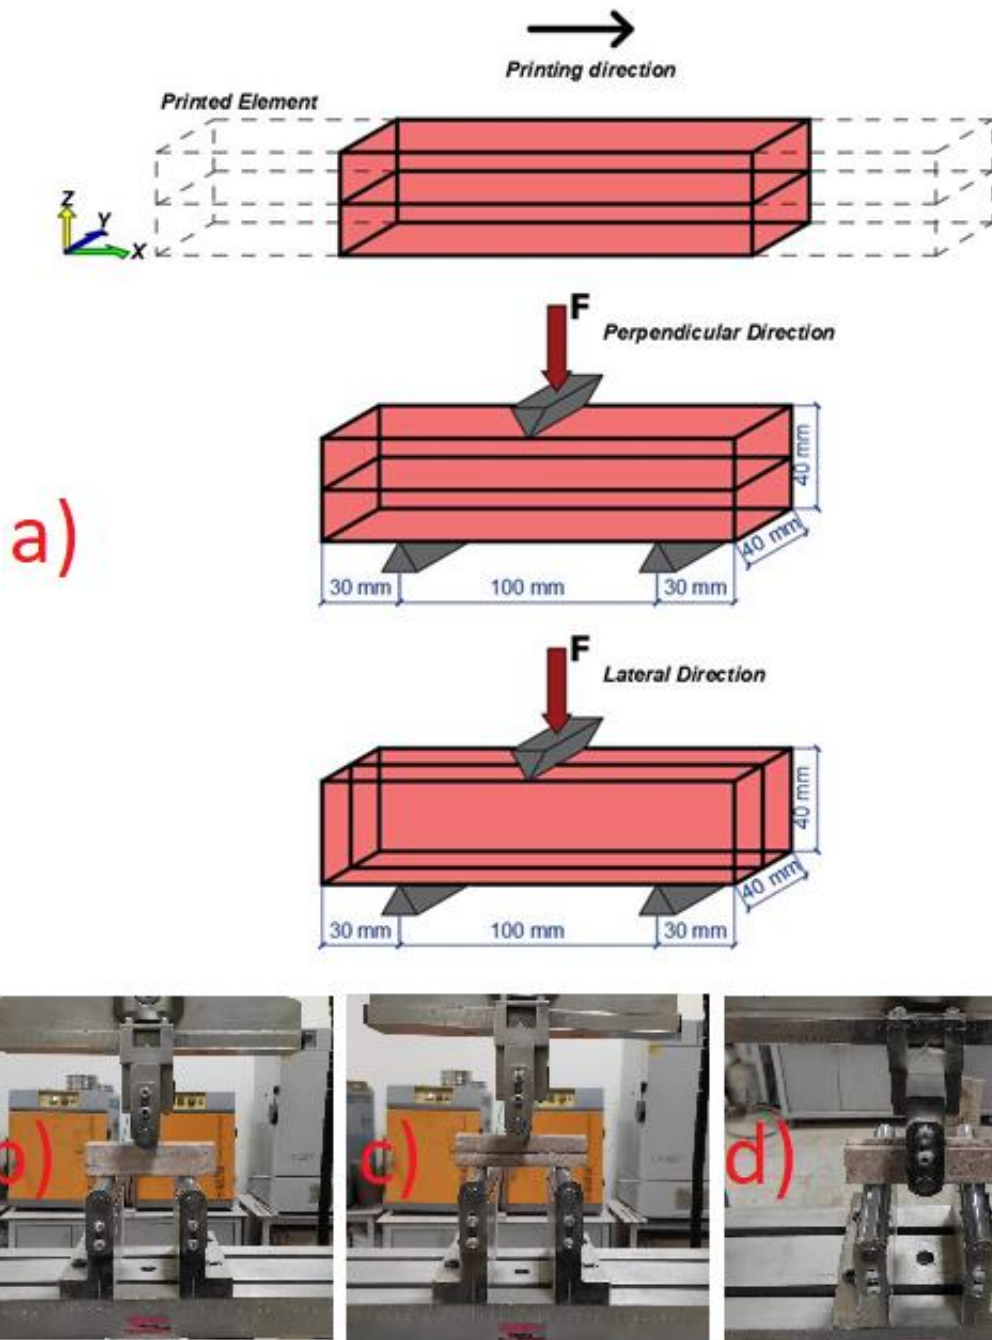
Representative images of prismatic specimens for different loading conditions: a) general schematic view, b) mold-casted specimen, c) 3D-printed specimen under perpendicular loading, d) 3D-printed sample under lateral loading.
